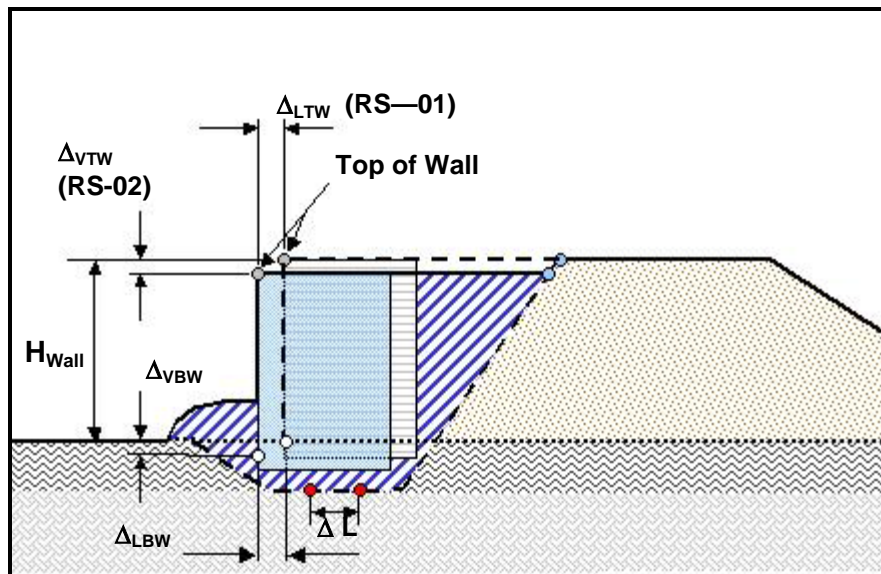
, ERS Sliding-Wedge Instability (Section B-B)
